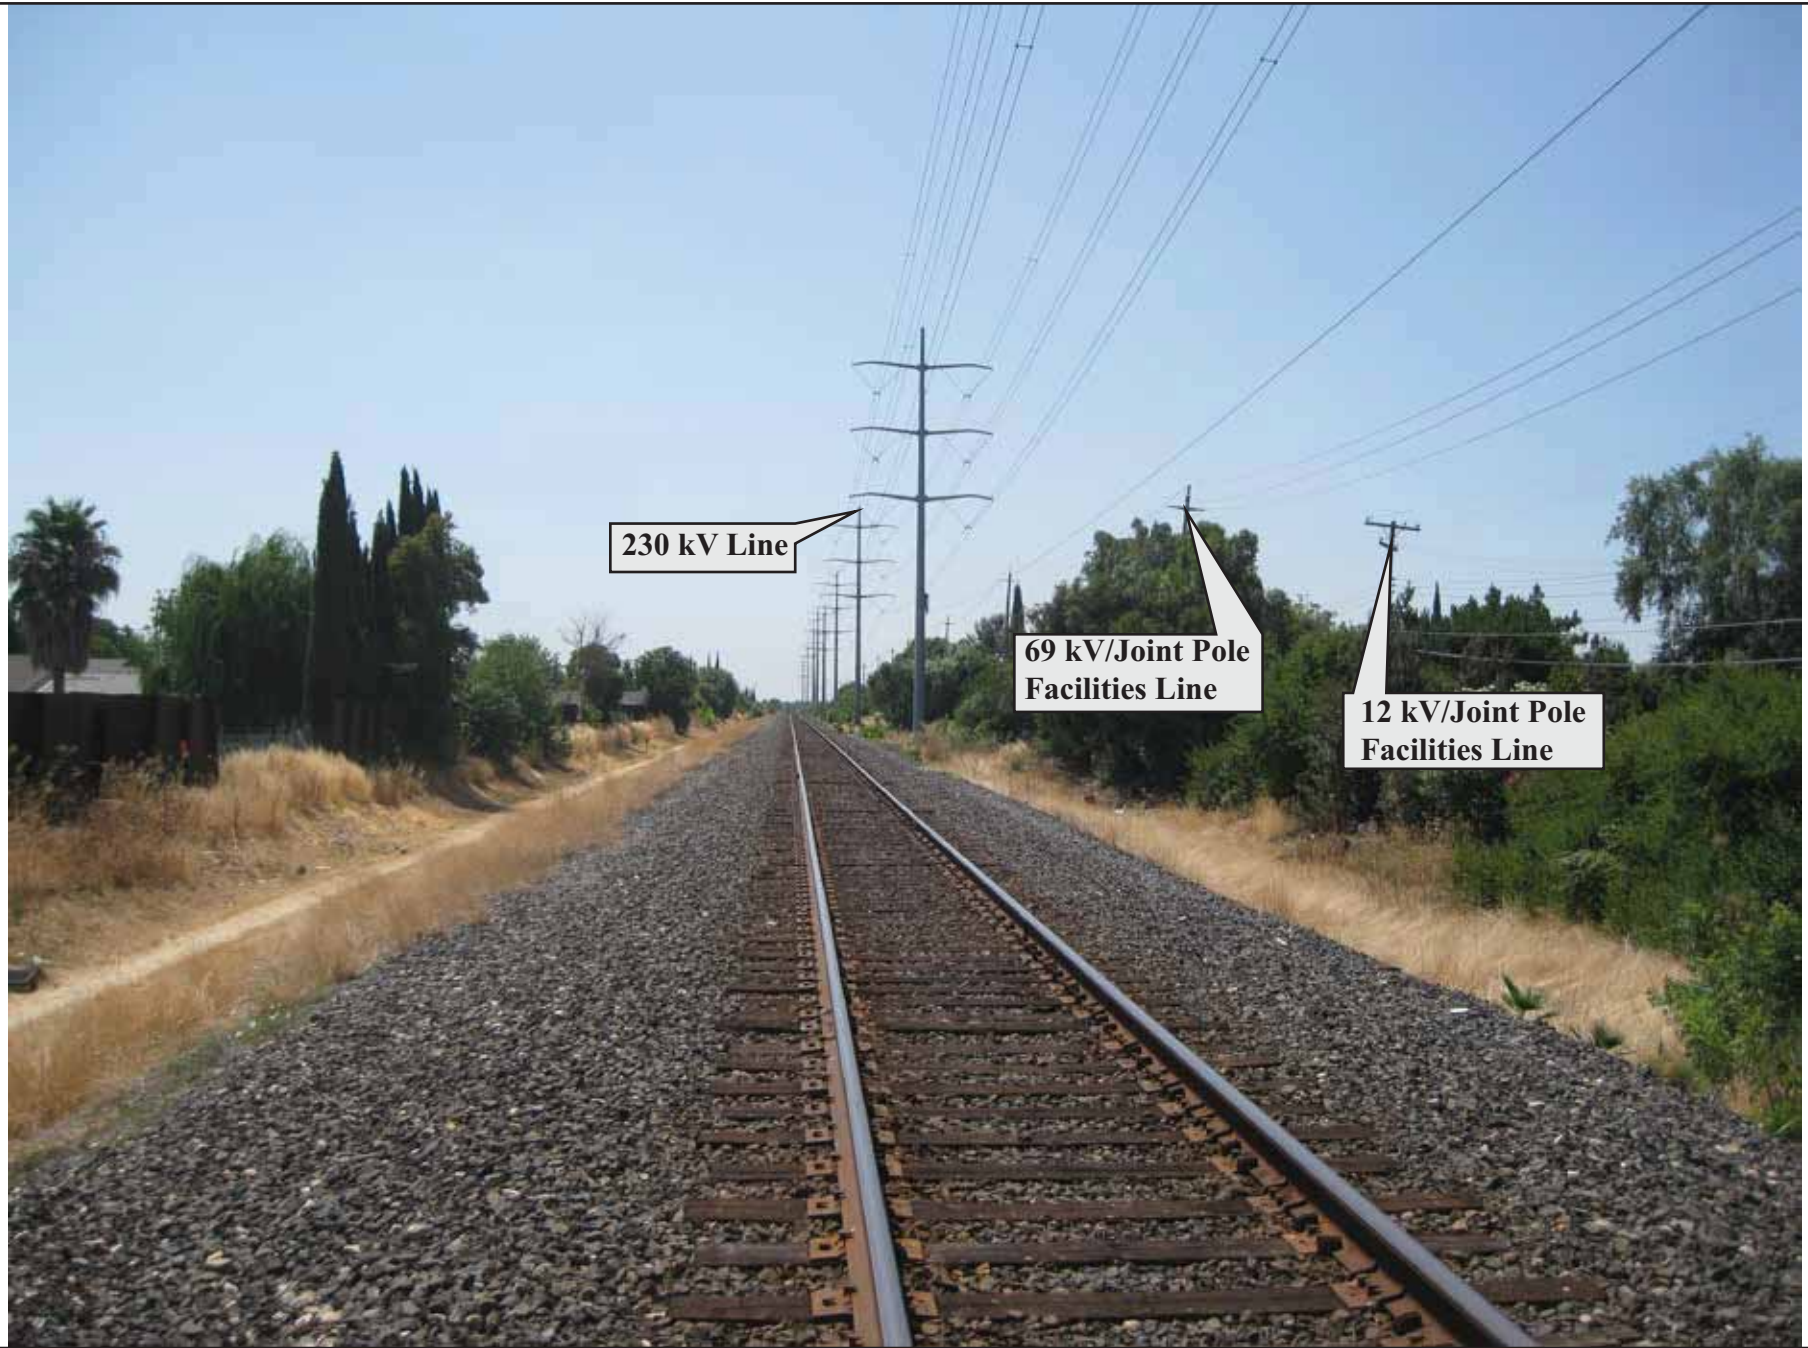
View of future LRT alignment, looking south from vicinity of Meadowview Road
